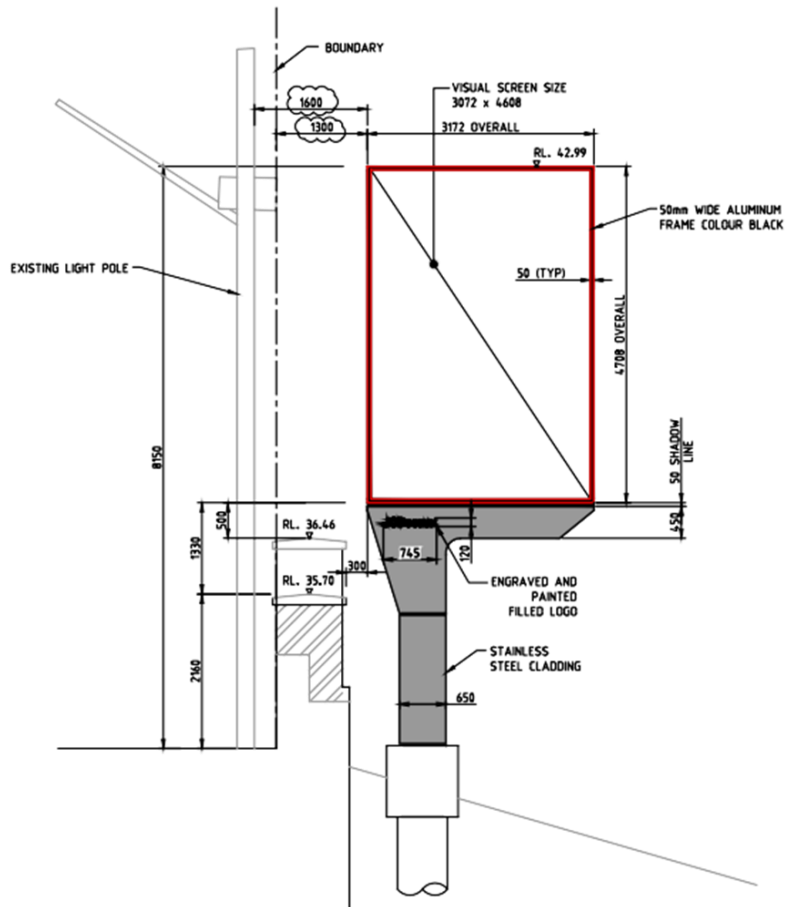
Elevation of proposed sign (Source: Dennis Blunt Consulting Engineers)
